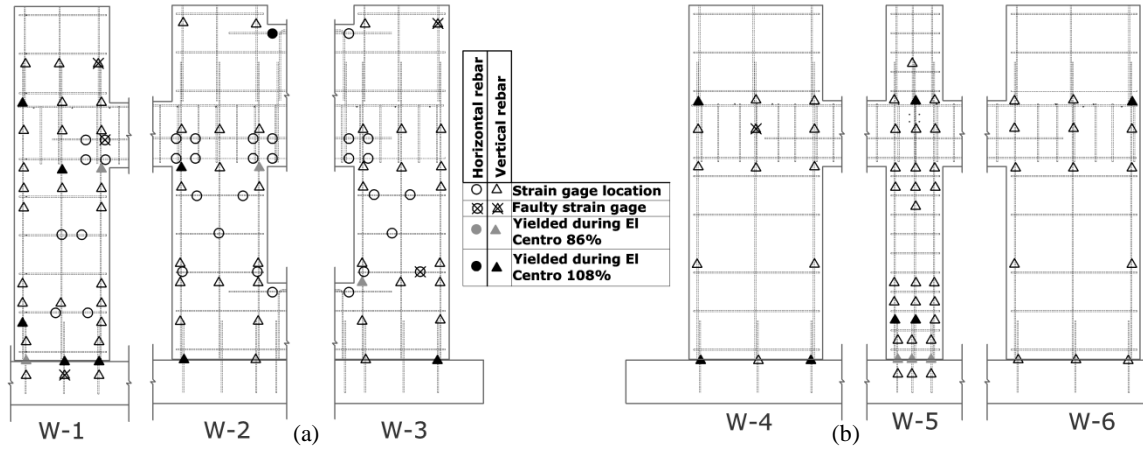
Yielding of reinforcement for a) interior wall and b) west exterior wall up to 108% El Centro.
